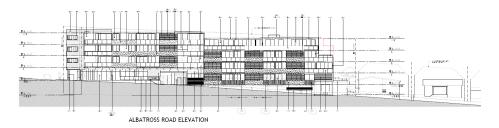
Elevation of the proposed development (western elevation – Albatross Road).
